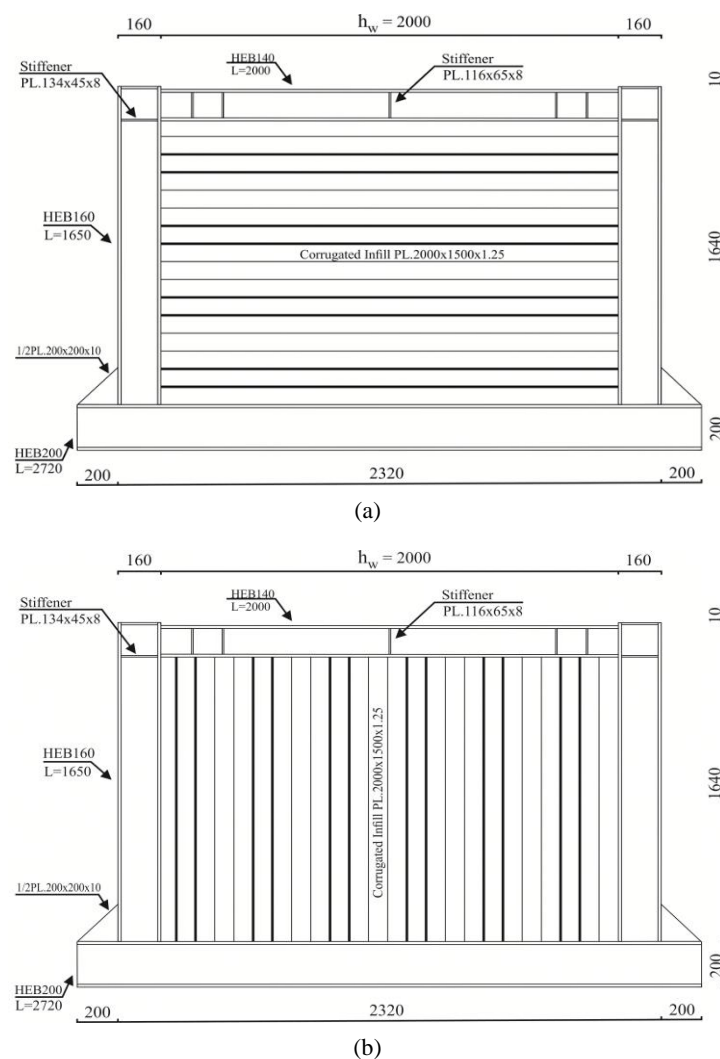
Geometric details of corrugated steel plate shear wall specimens tested by (Emami *et al.* 2013): (a) Tested horizontal corrugated-web shear wall; and (b) Tested vertical corrugated-web shear wall
